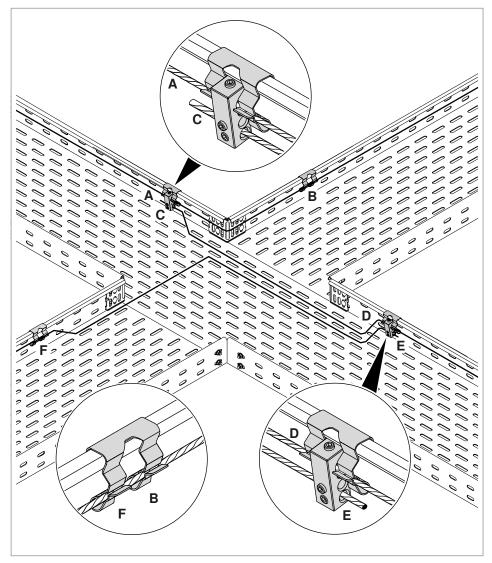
MKS, mounting of conductor cable cross-over, single connection terminal
